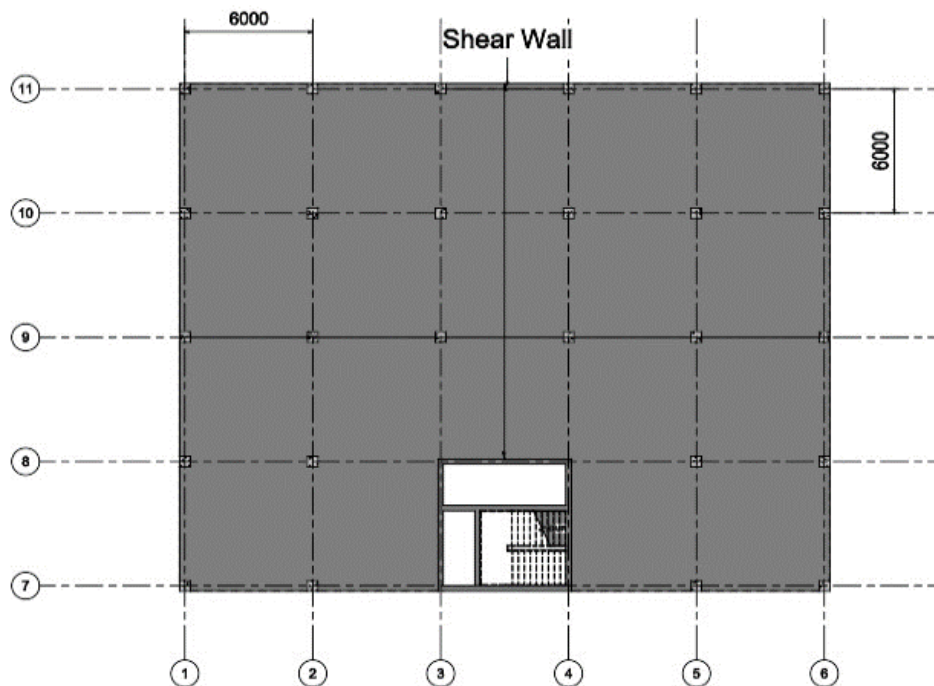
Building plan showing size and grid spacing (Van Der Westhuyzen, 2020)
